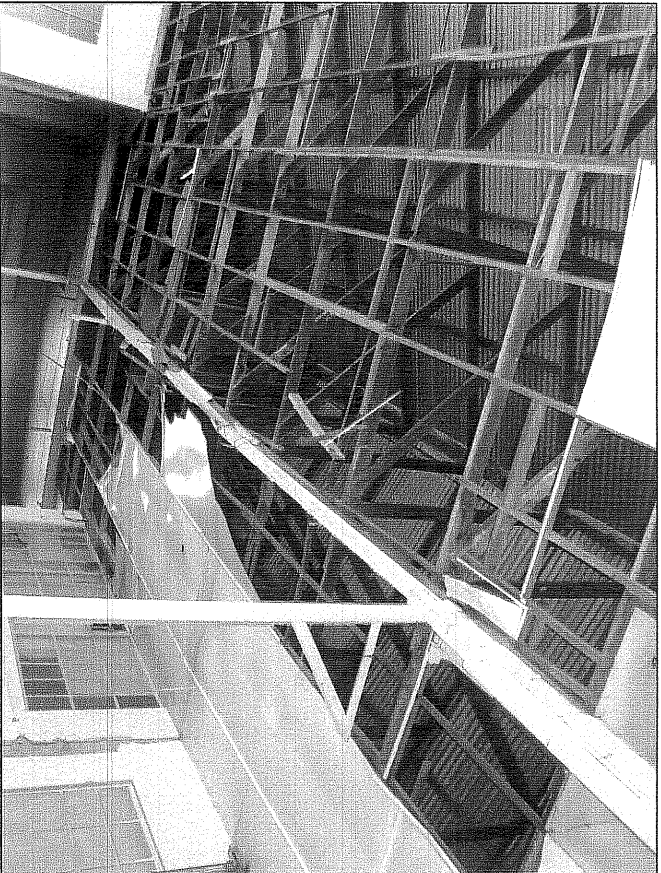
Roof rafters inside the main building at the old creamery site, Winzburg.
